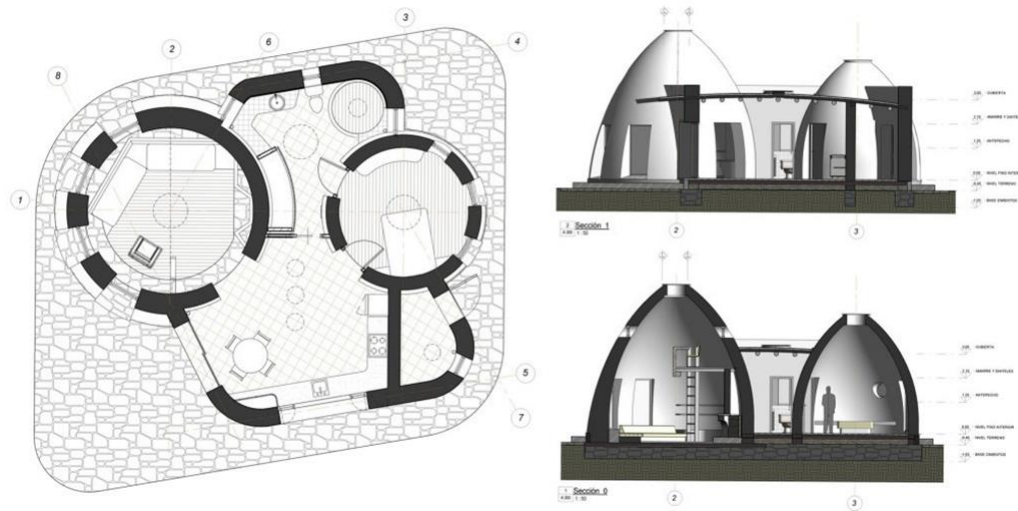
An example of the plan and section of the Goltaftan building (Bani Massoud, 2008).
